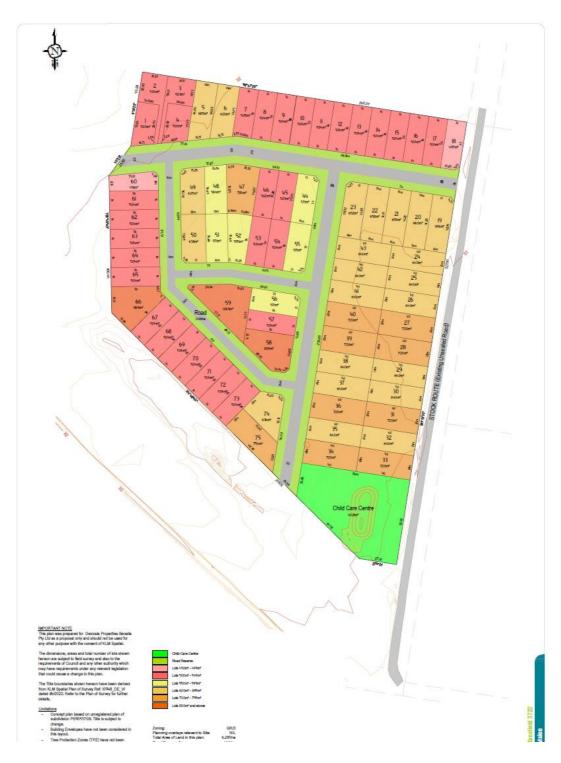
Proposed subdivision layout (note childcare centre site in green). Source: Application documents
